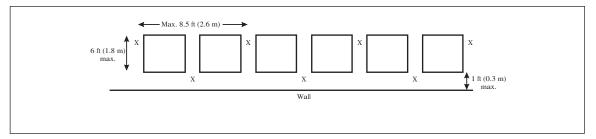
Plan view of alternative in-rack sprinkler arrangement for single-row racks up to 6 ft (1.8 m) deep located against wall
